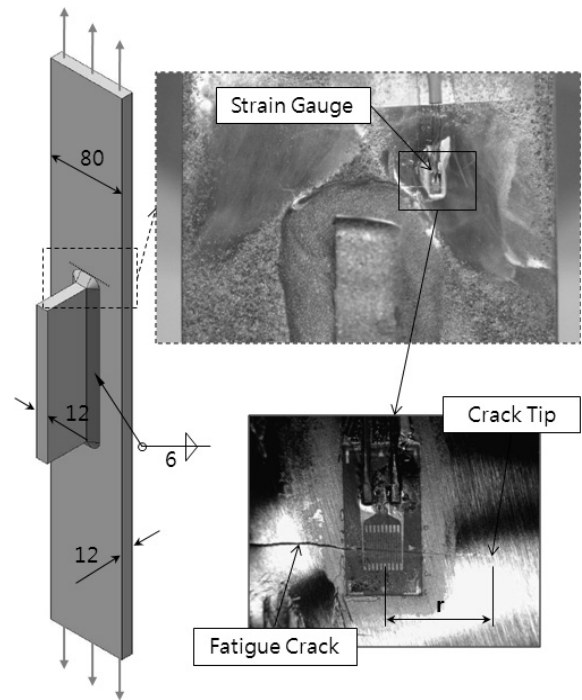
COD Measurement in the Out-of-plane Gusset Welded Joint
